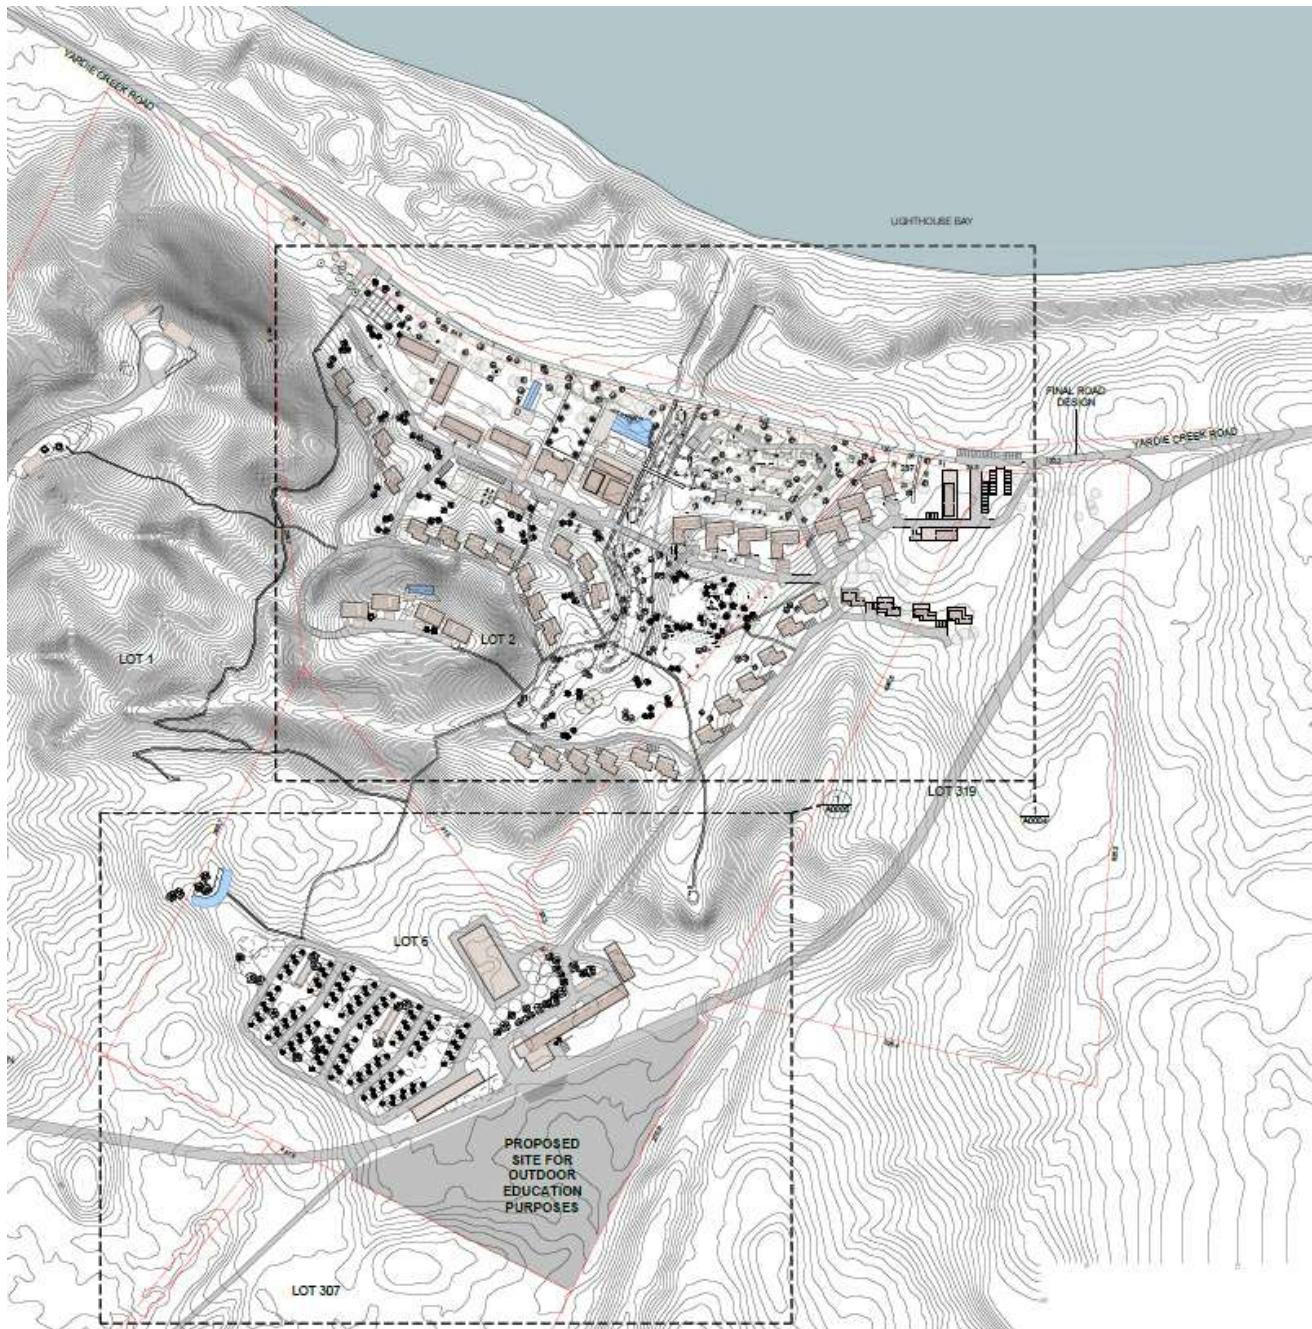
Project layout and footprints, resort (top) and campground (bottom) (Kerry Hill Architects, Site Master Plan).
